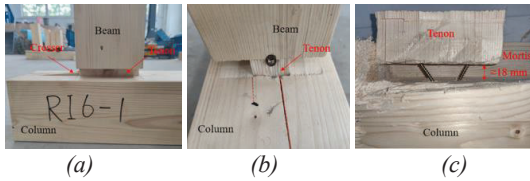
Failure modes of RI6 group: (a) pull-out of tenon and crosser; (b) crack on the column and (c) withdrawal of STS.
